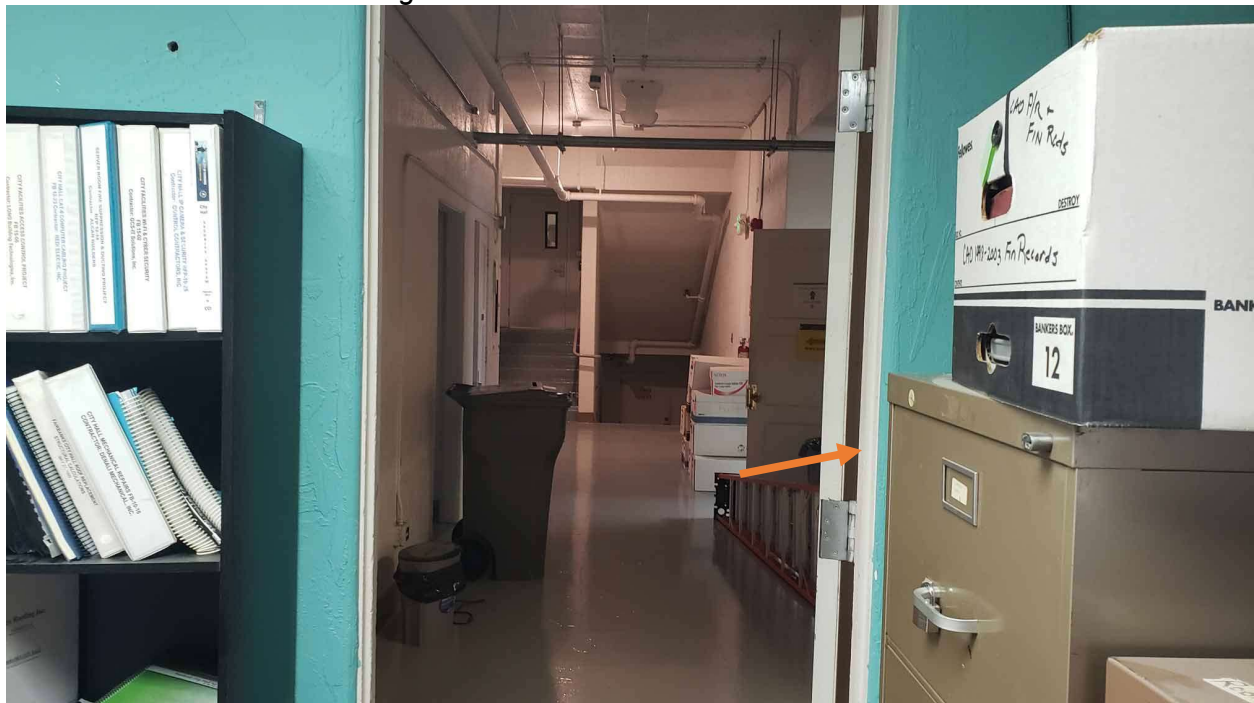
Main Door Frame in Wall S of Classroom 3 (Pb-98) contains LBP at a concentration of 1.7 mg/cm².
